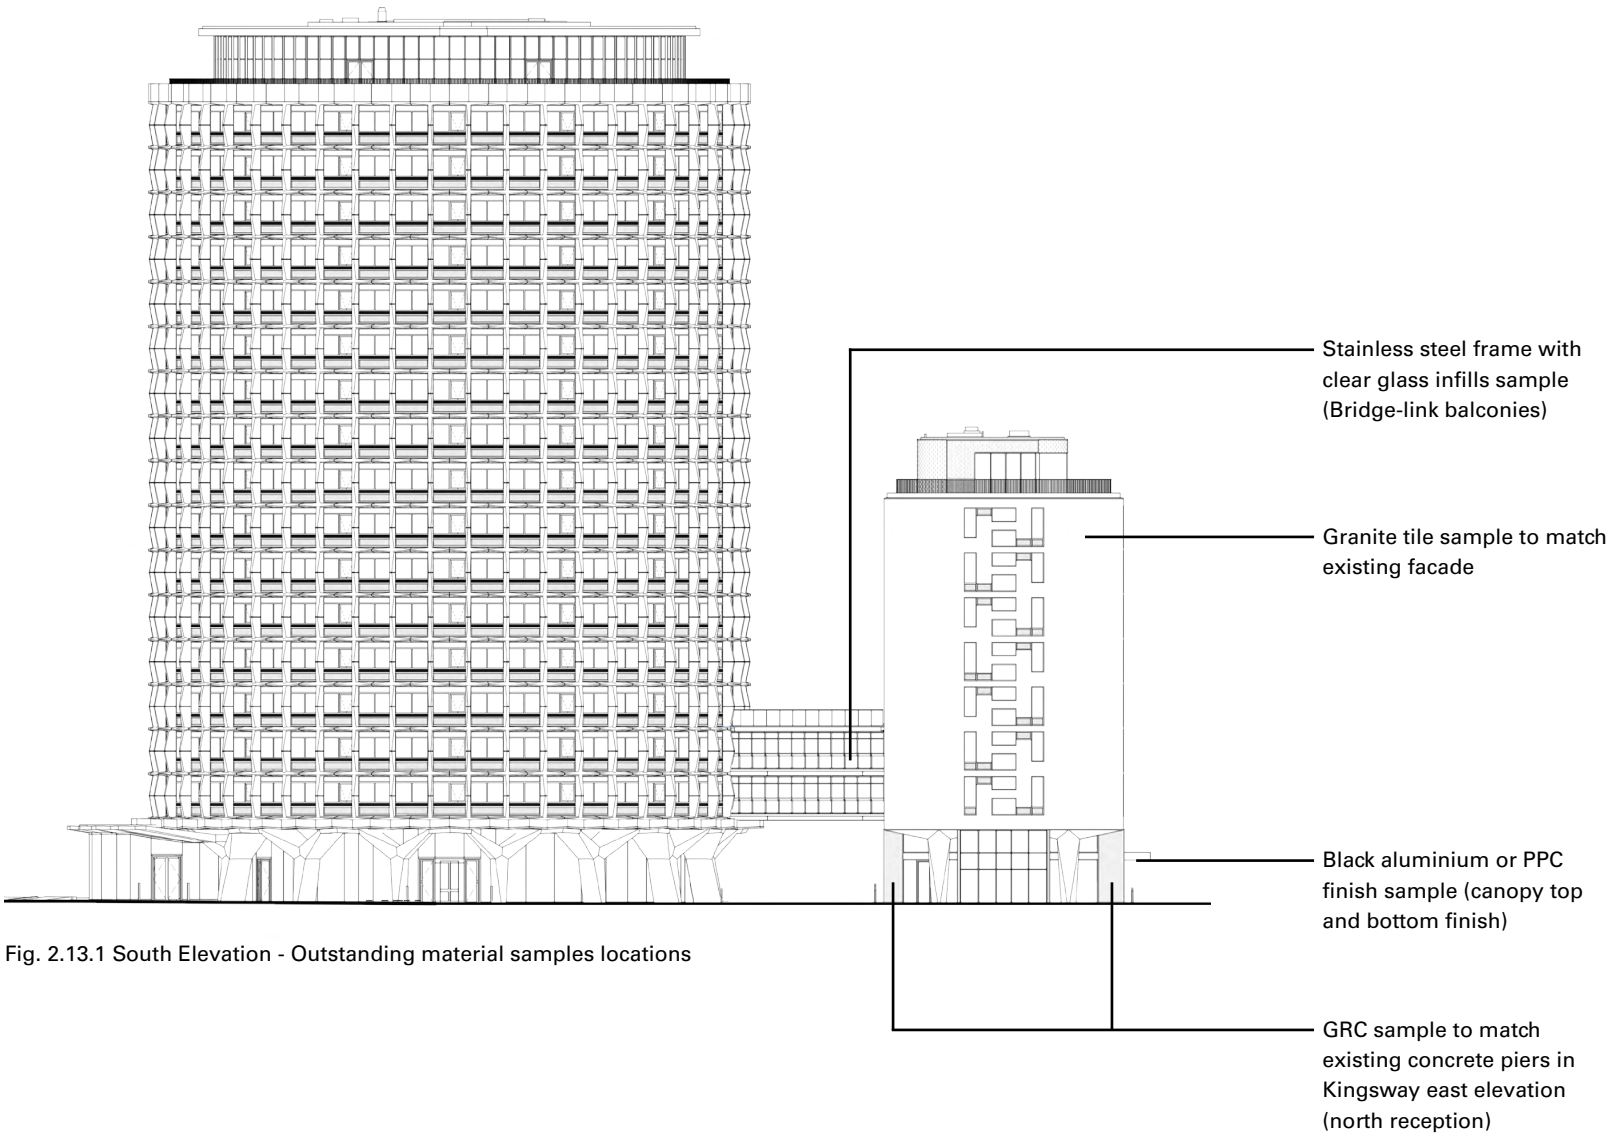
South Elevation - Outstanding material samples locations
